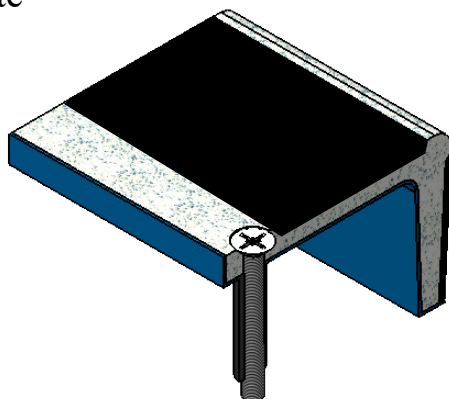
Section view of fixing detail for stair nosing- SN293/WL/84
